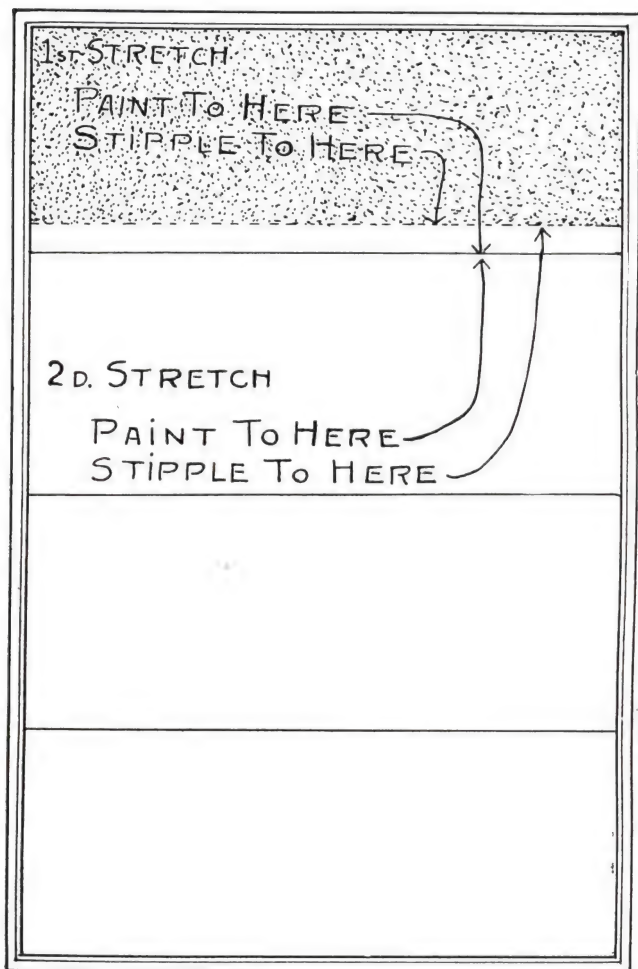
B.—The Best Stippling Method to Avoid Having the Laps Show Between Stretches on a Ceiling or Wall Is Pictured Above. Do Not Double Stipple Where Stretches Join Together.
